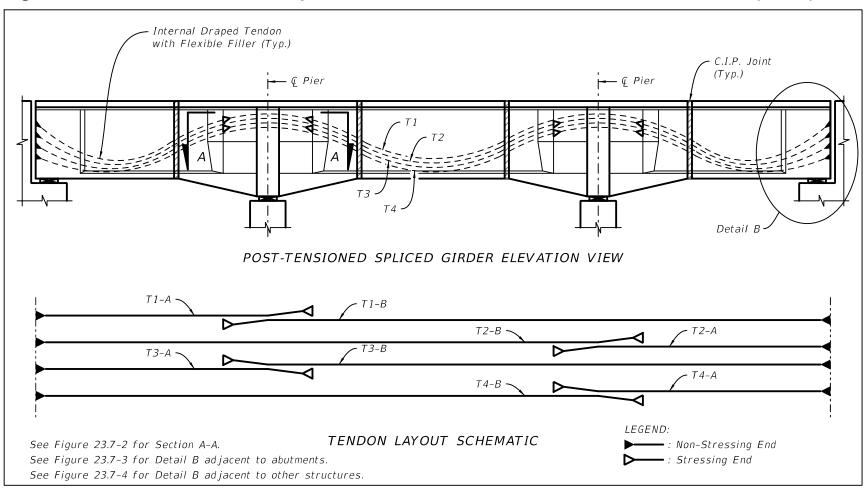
Post-Tensioned Spliced Girder Details - Tendons Internal to the Web (2 of 4)
